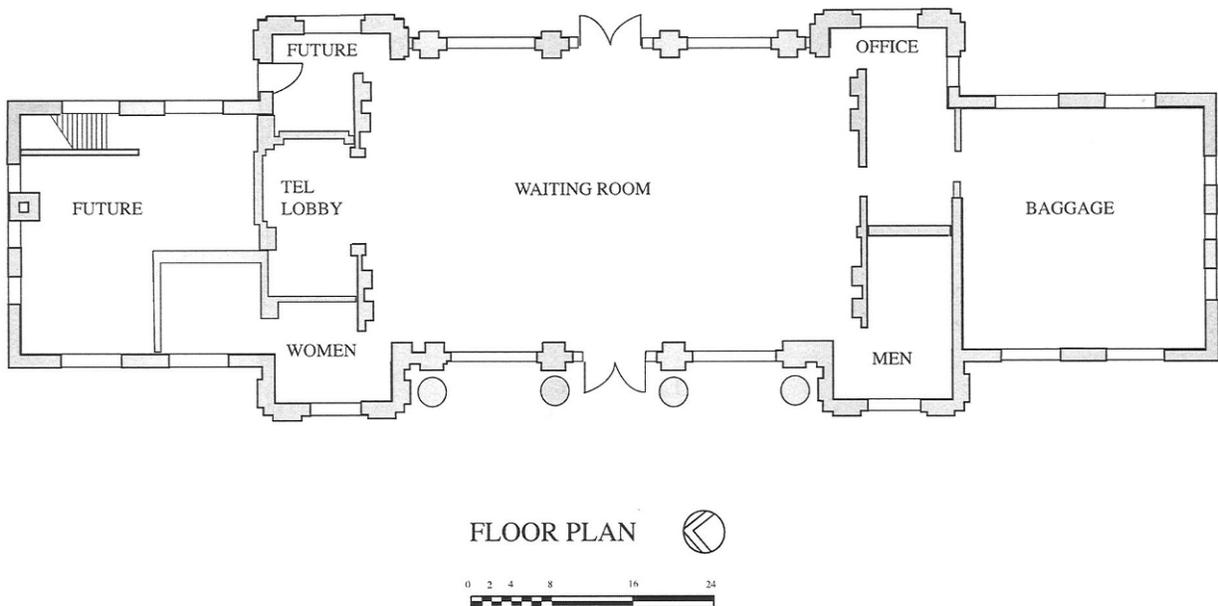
Salem Southern Pacific Railway Station, Floor Plan.
